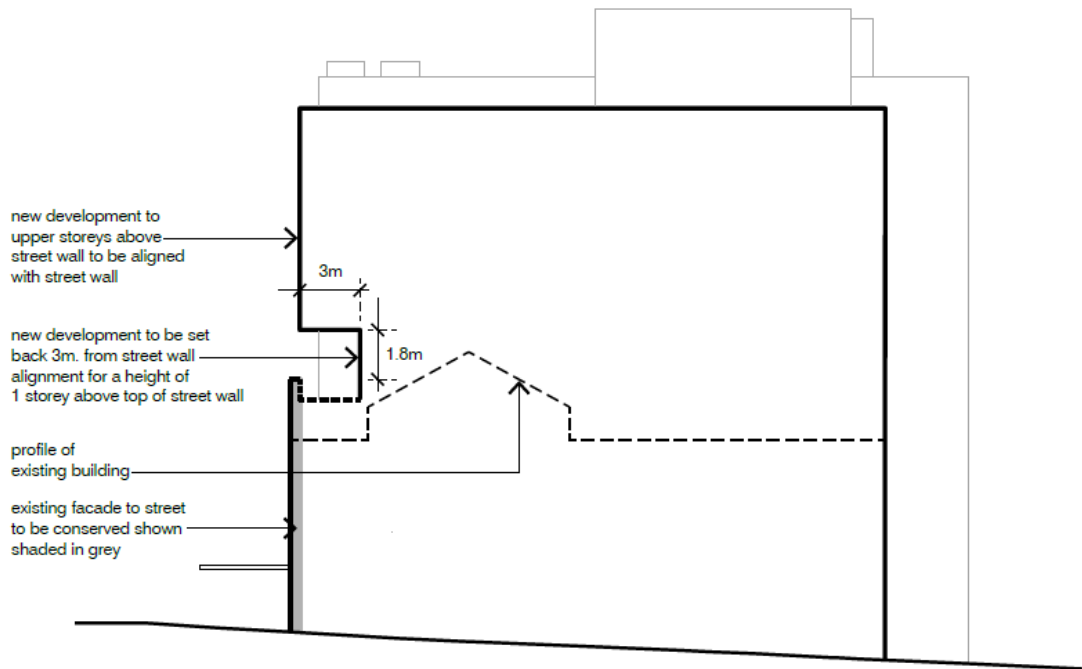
3m setback above 18-20 Darlinghurst Road for height of 1 storey above top of street wall, built to street alignment above
